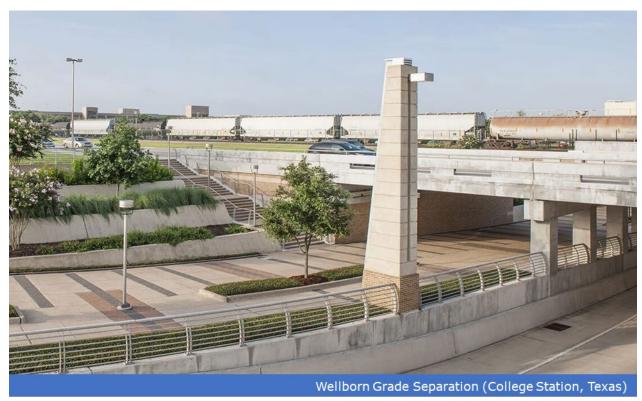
Example of Railroad Grade Separation - Railroad Over Roadway⁴
